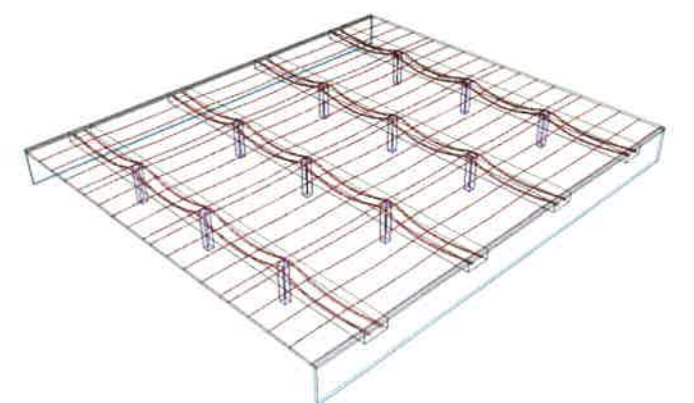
Analytical Model of a Floor System with Slab Band (HK Building Department validation floor) (P465)
